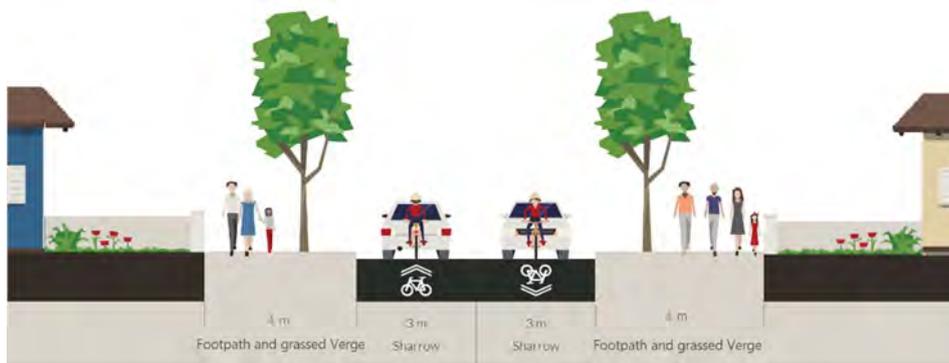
Route 6A, Cross Section A-A Proposed
